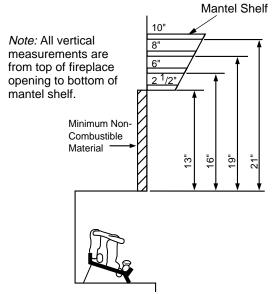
Minimum Mantel Clearances for Built-In Installation
